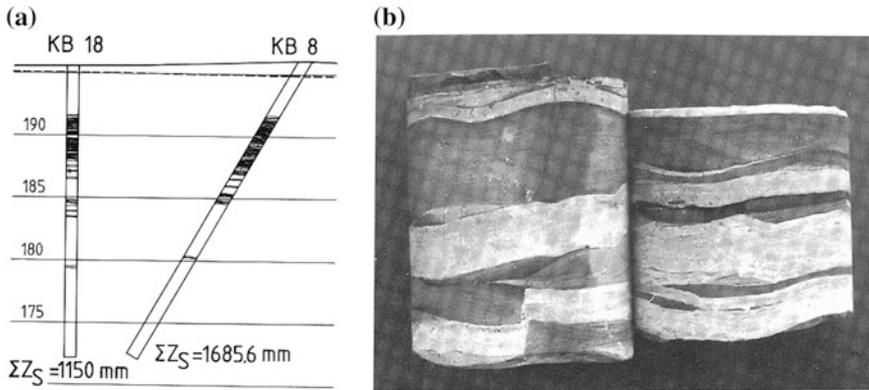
a, b Twisté Dam: groutstone layers deposited along fractured bedding planes demonstrate inadequate grouting technology
